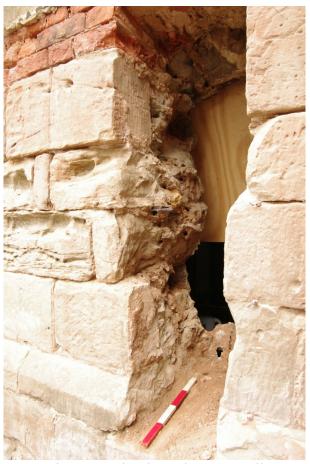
Slot through tower wall Looking north-west from outside. 0.4m scale
